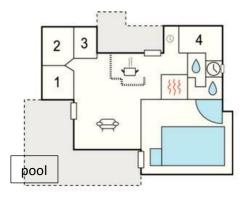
Floor plan of NO\'ASOL test summerhouse with indoor pool.
